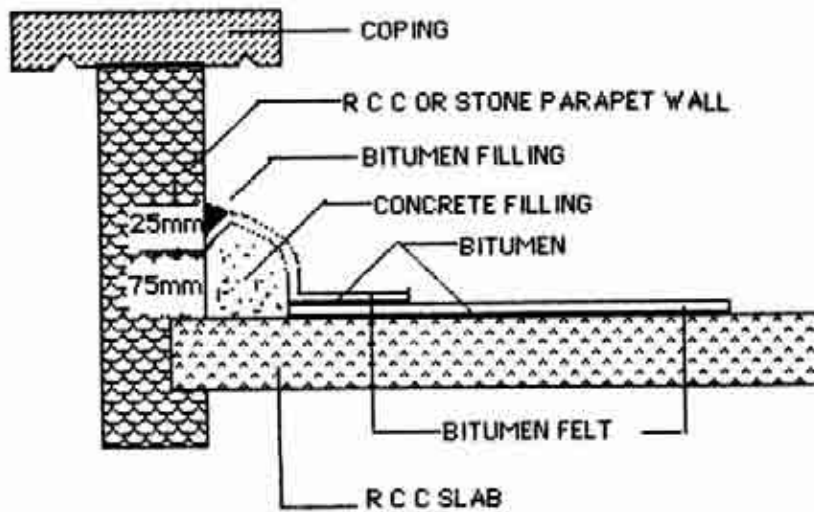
DETAILS OF WATERPROOFING TREATMENT IN PARAPET WALL WHERE CUTTING OF GROOVE IS NOT POSSIBLE
